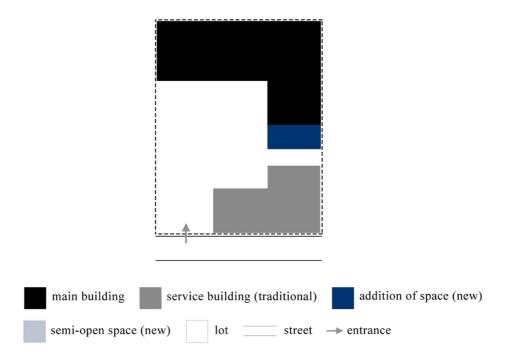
Case #17 House - Organization of the Buildings on the Lot
